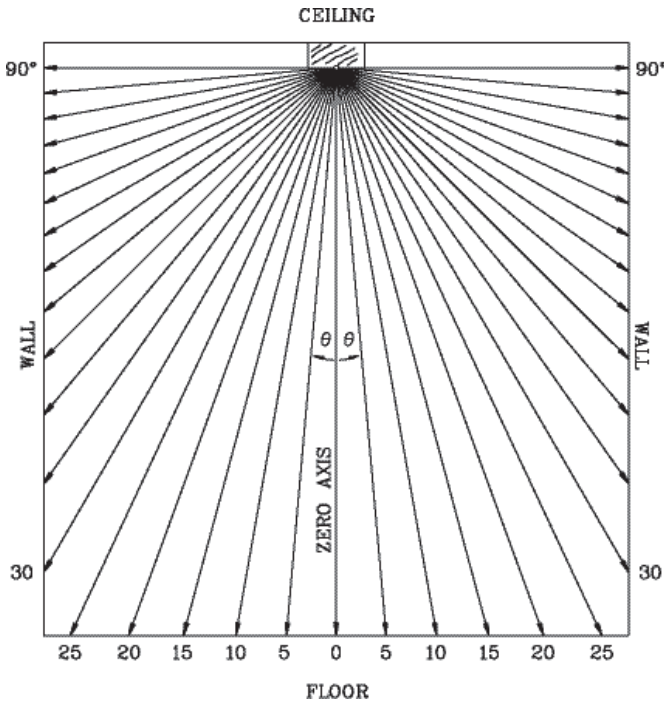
Strobe Light Output, Ceiling to Walls and Floor
